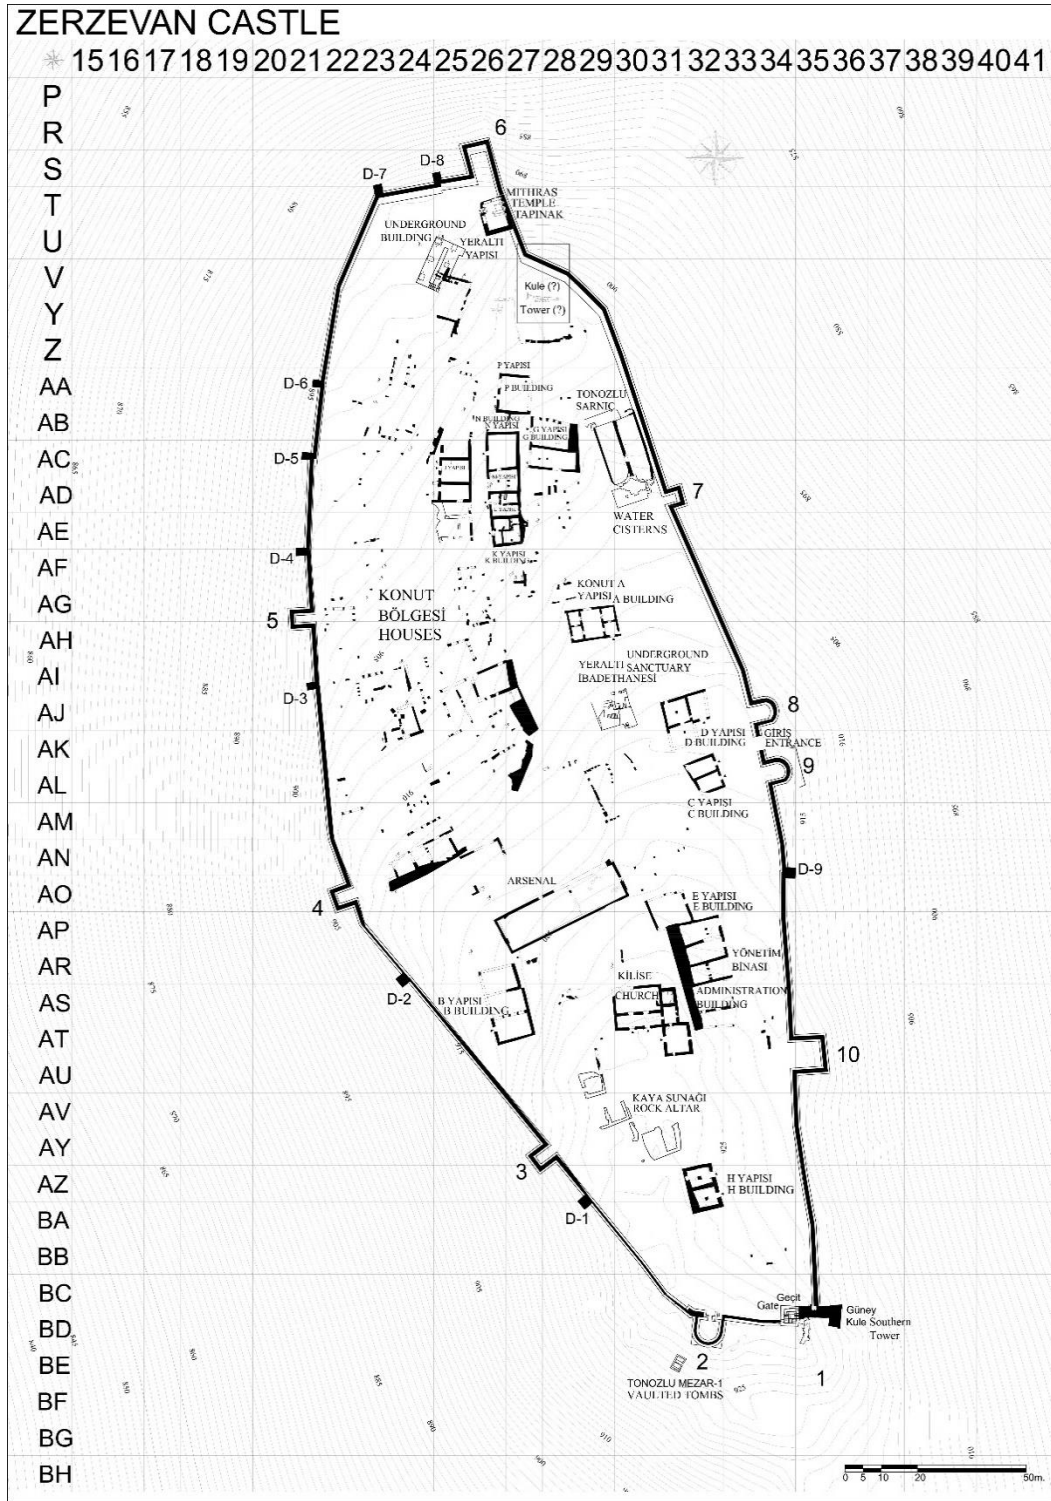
Castrum Zerzevan, Topographical Plan. (Zerzevan Excavation Archive)
